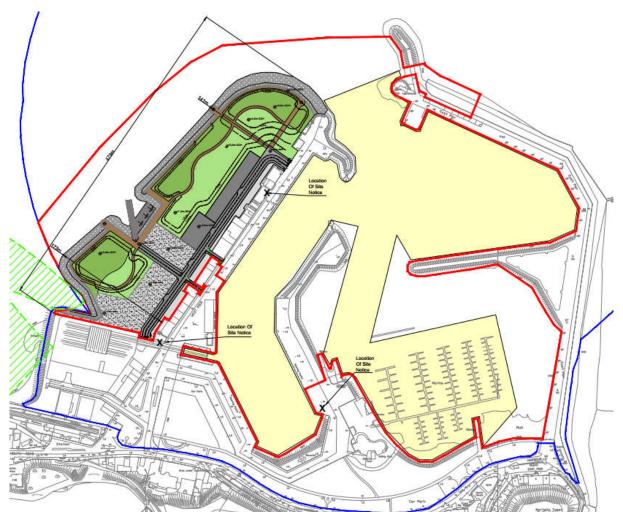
Extract from Project Drawing showing the proposed reclamation area west of the West Pier and the dredge area in yellow. Drawing no. 19934-5002 Site Layout Plan.
